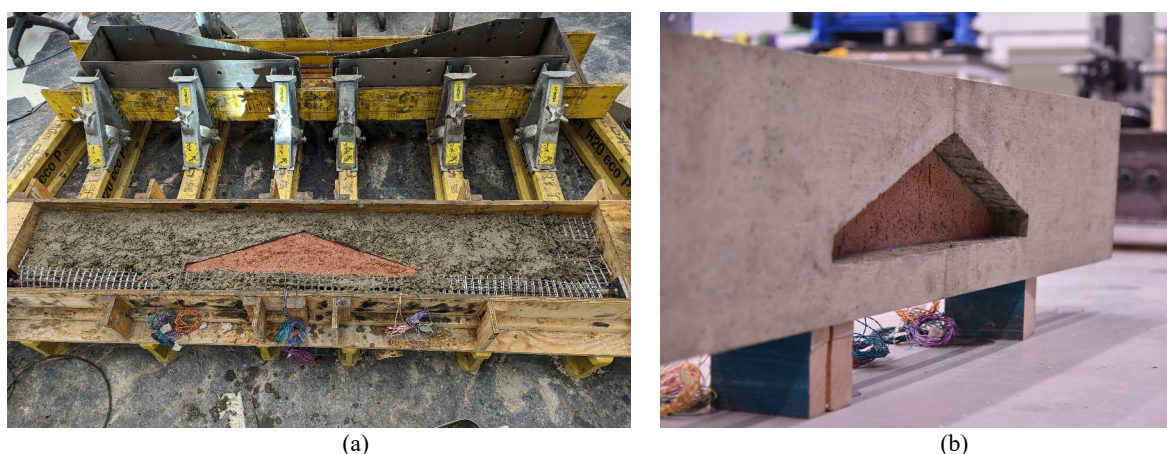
Manufacturing of test specimen (a) Inserting the reinforcement in stages after a layer of the functionally graded concrete was already cast (specimen is cast sideways) and (b) tailored specimen after demoulding.
